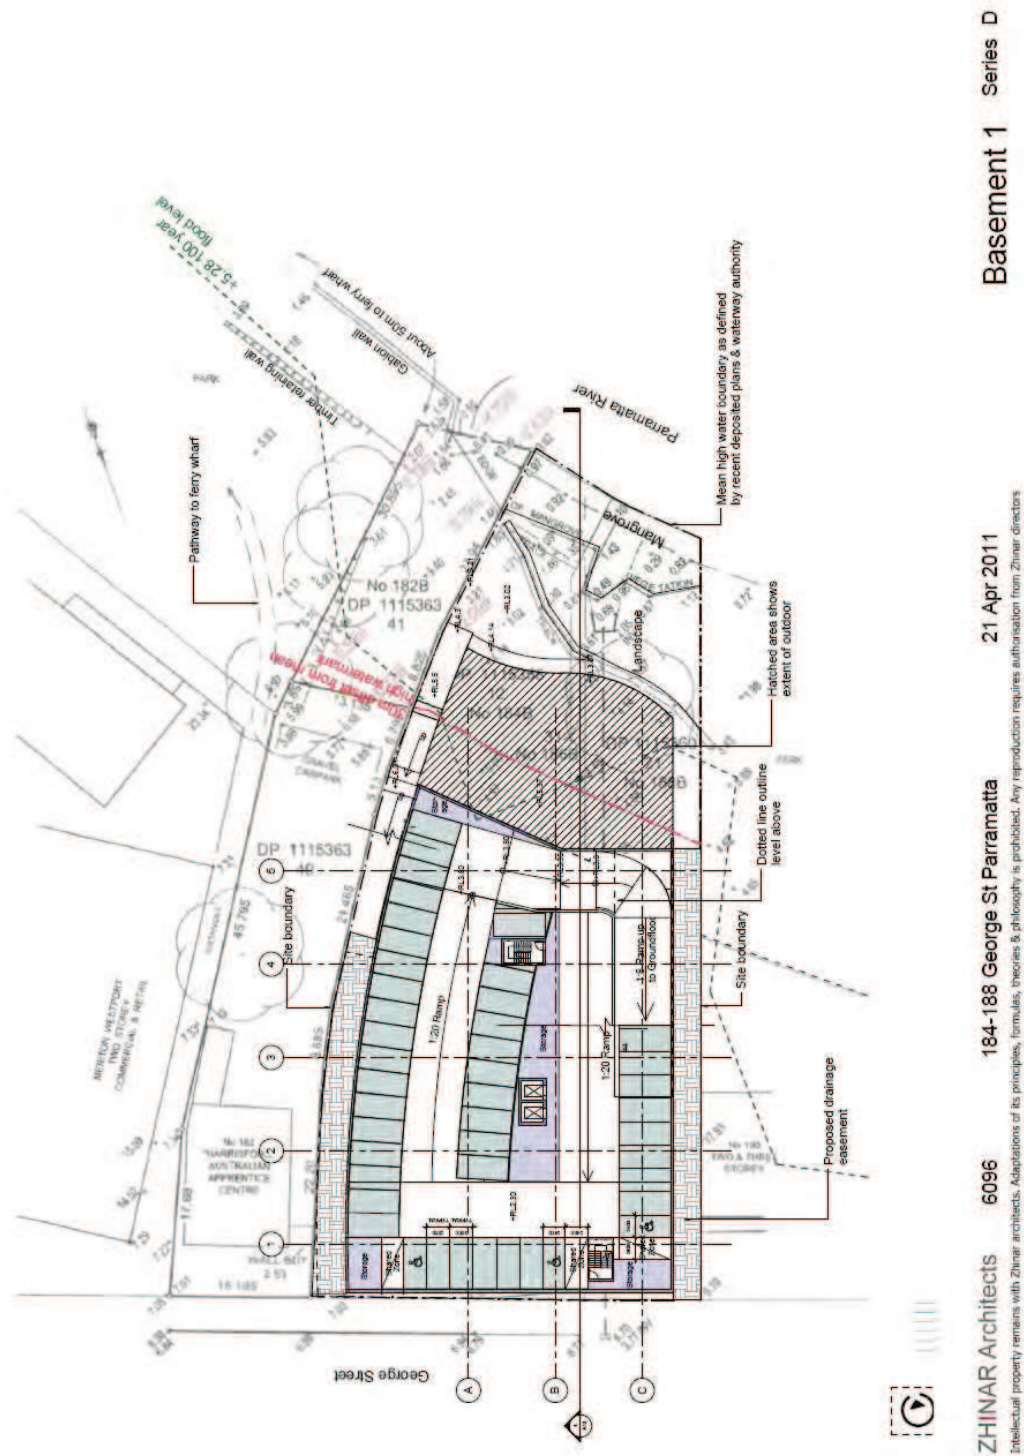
Proposed Development, 184-188 George Street, Parramatta, Basement Level 1.
